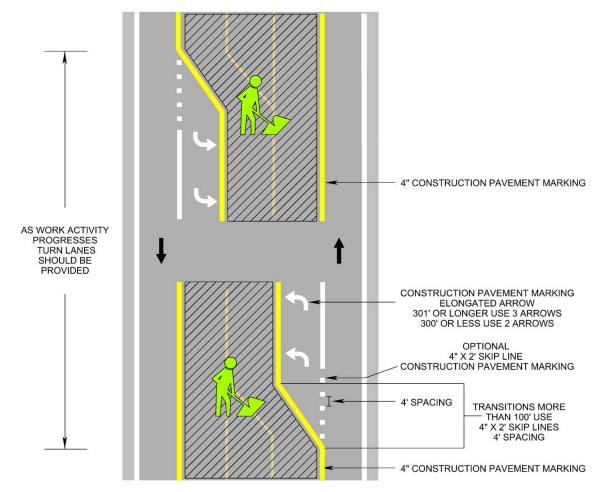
F-10, Construction Pavement Marking for Tapers and Turn Lanes
